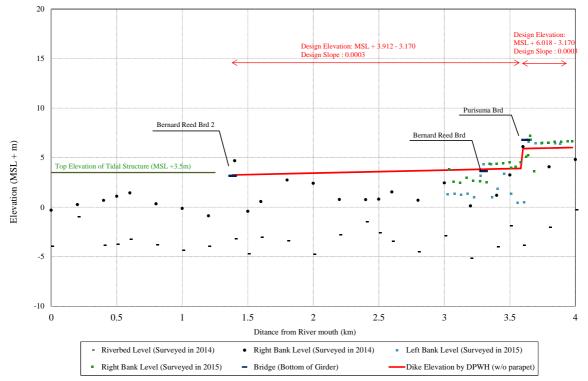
shows longitudinal profile of the alignment plan. In the longitudinal plan designed by DPWH, there are not specific values of top elevation of the dike but only a description of design slope (0.0003), which was used for alignment plan. It was confirmed that the elevation of dike at Bernard Reed Bridge 2 is supposed to be lower than elevation of the coastal dike proposed by DPWH.
